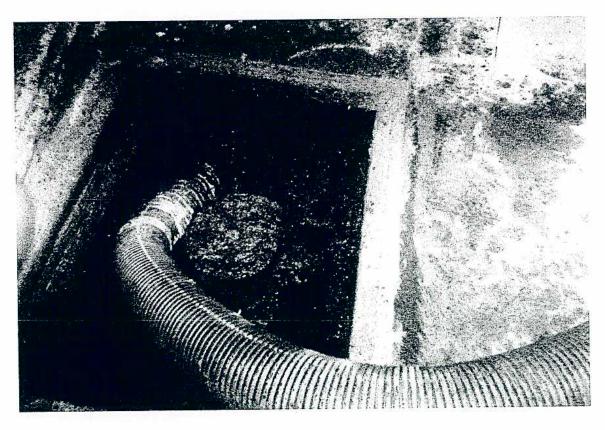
Pumping water and sediment from well head area in Building 4 Pit.
